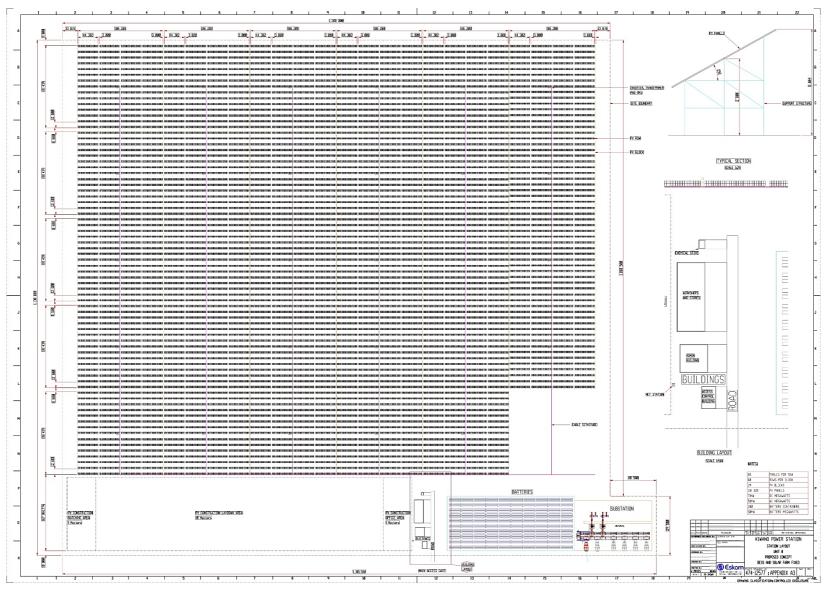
Proposed layout alternative for the fixed tilt PV structures
